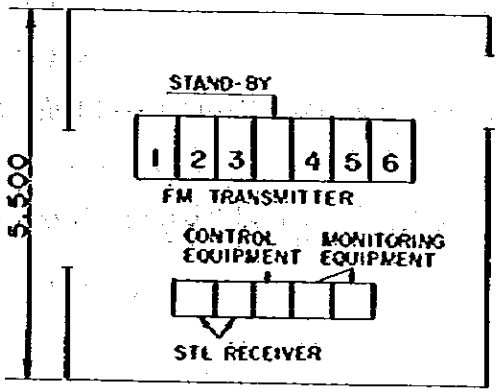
FLOOR LAYOUT FM TRANSMITTING
